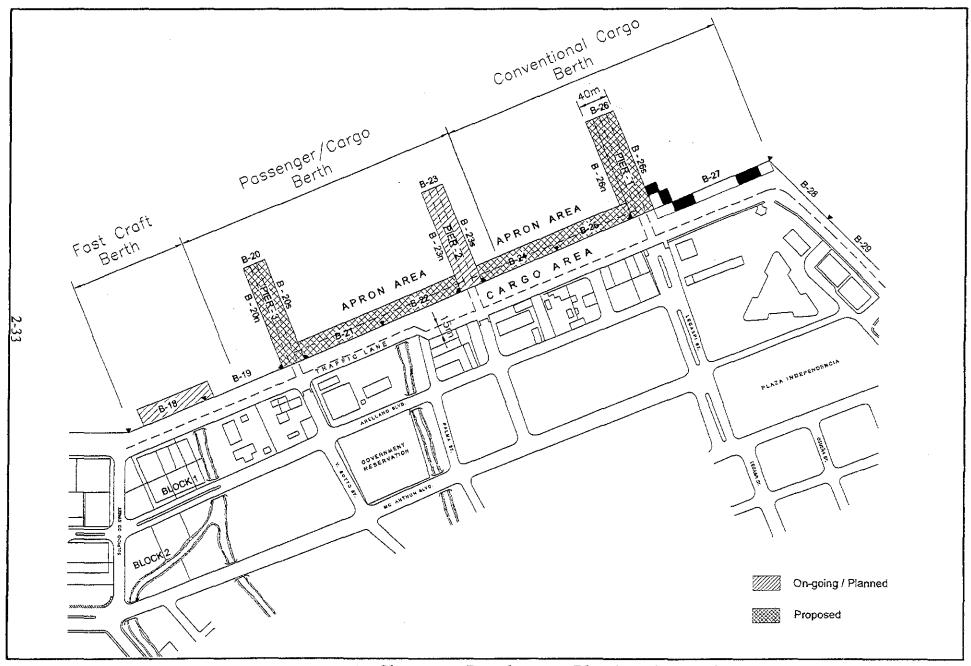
Short-term Development Plan (PMO 3 & 4)
